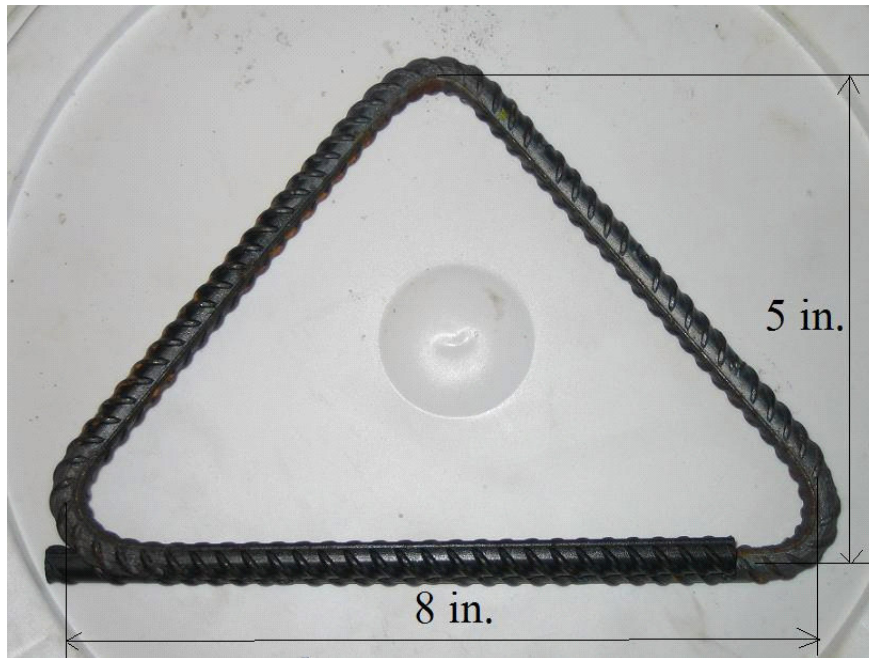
#3 bar bent in a triangular shape for bottom bulb confining reinforcement
